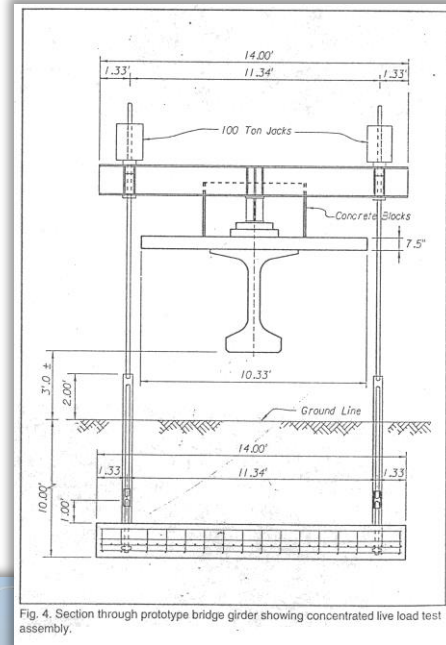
Section through prototype bridge girder showing concentrated live load test assembly.
